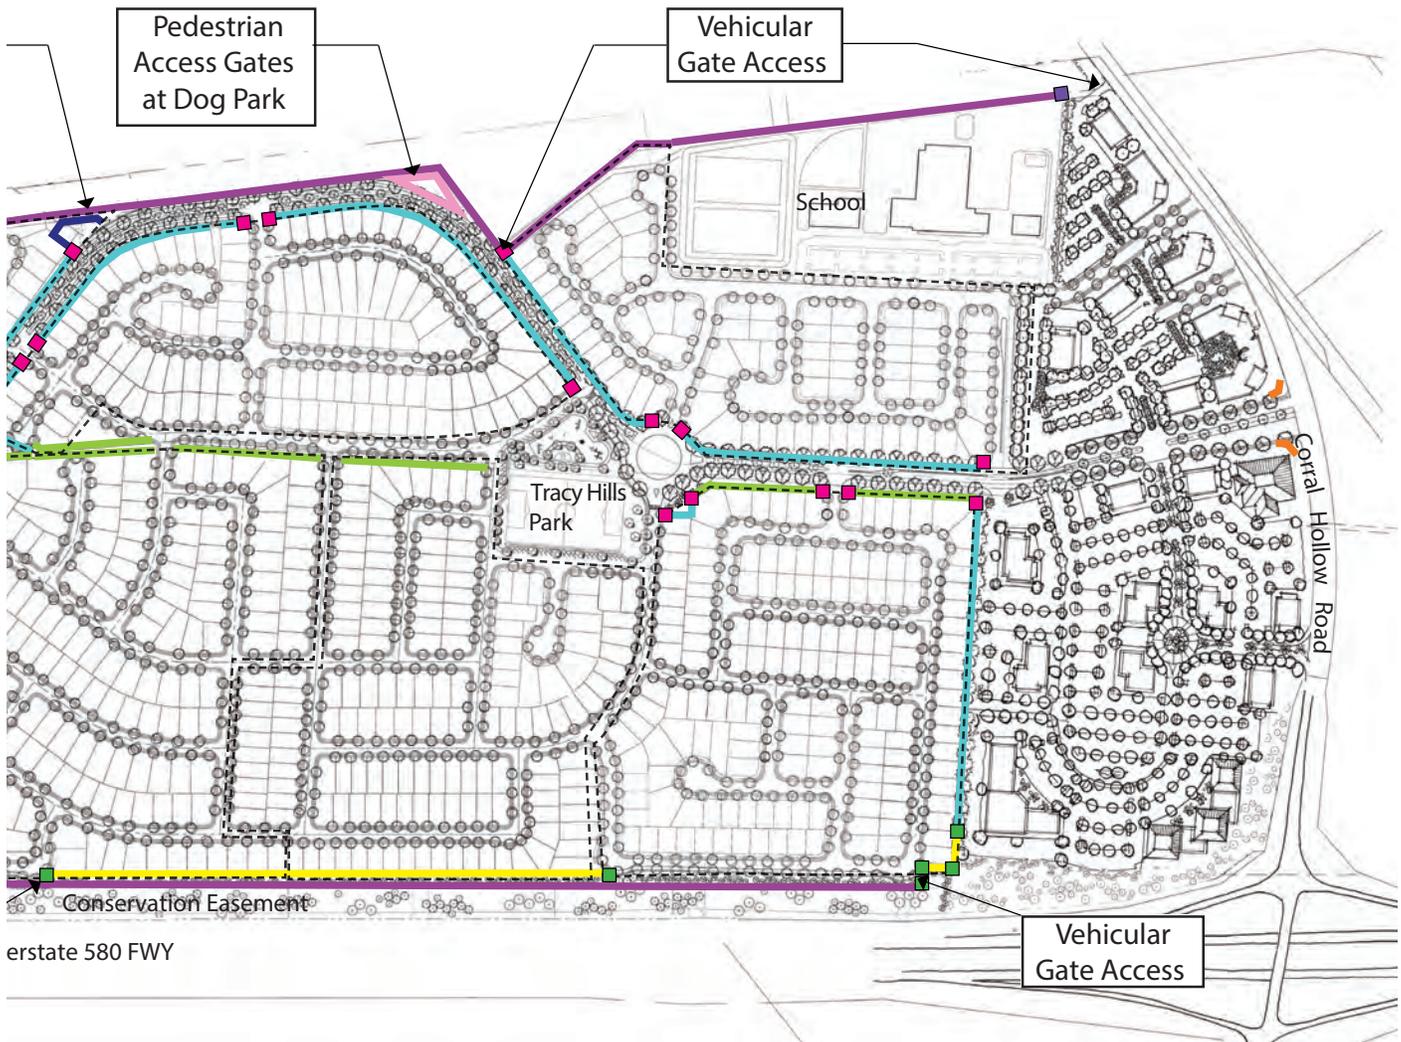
Master Wall and Fence Plan - Phase 1A
